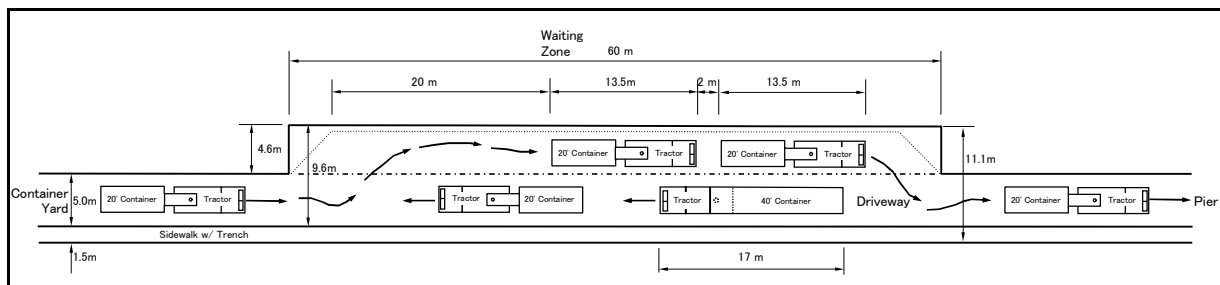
Waiting Zone Installed in the Middle of Access Trestle
